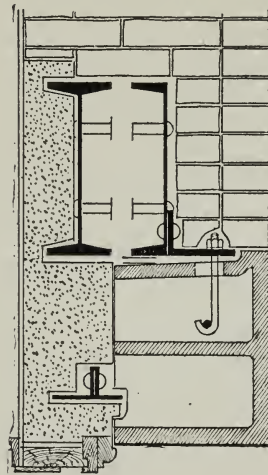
shows metal supports formed by I-beam, angle and anchor. The terra-cotta lintel has a shelf bearing with anchor clamped over top flange of beam. The staff-bead is so placed that the terra-cotta lintel will not be injured from any deflection of the I-beam.
